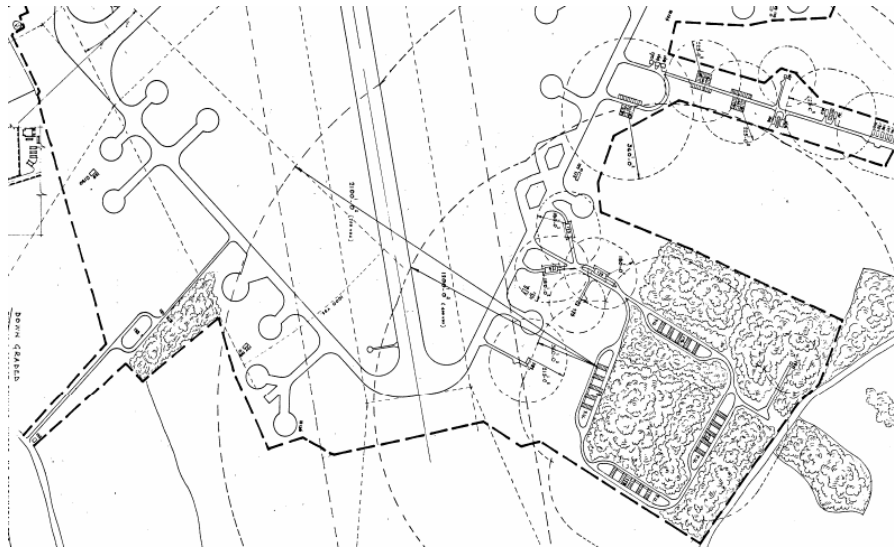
Proposed layout for RAF Knettishall, 1943
